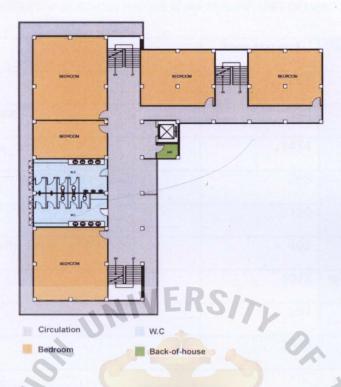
FLOOR PLANS OF BUILDING B: PATTAYA REDEMPTORIST SCHOOL FOR THE BLIND
